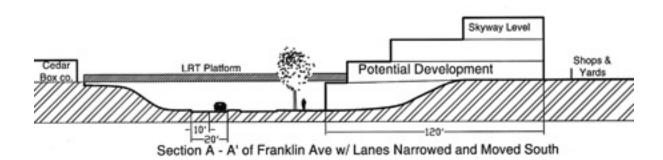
Revised section showing development area when Franklin is narrowed to the south of the median.
